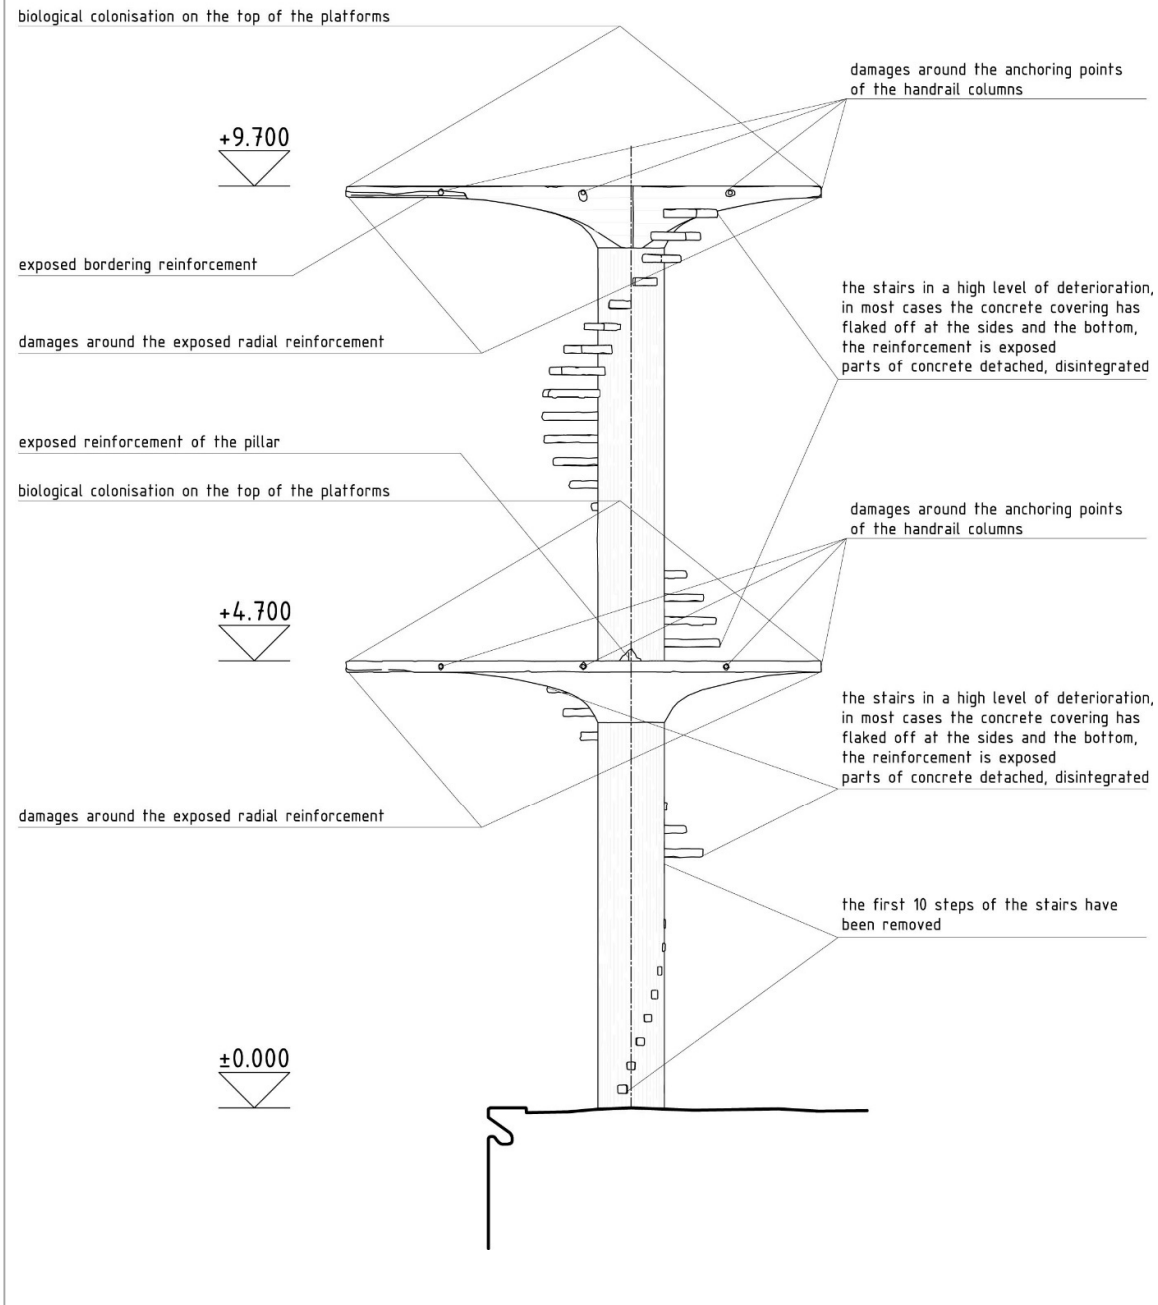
South elevation with the indication of the most important damages.
